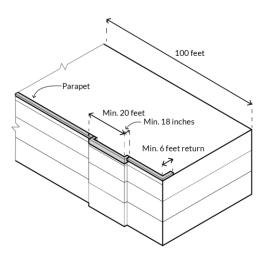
E.2.B: ROOFLINE OFFSET, PARAPETS AND PARAPET SUBSTITUTION
